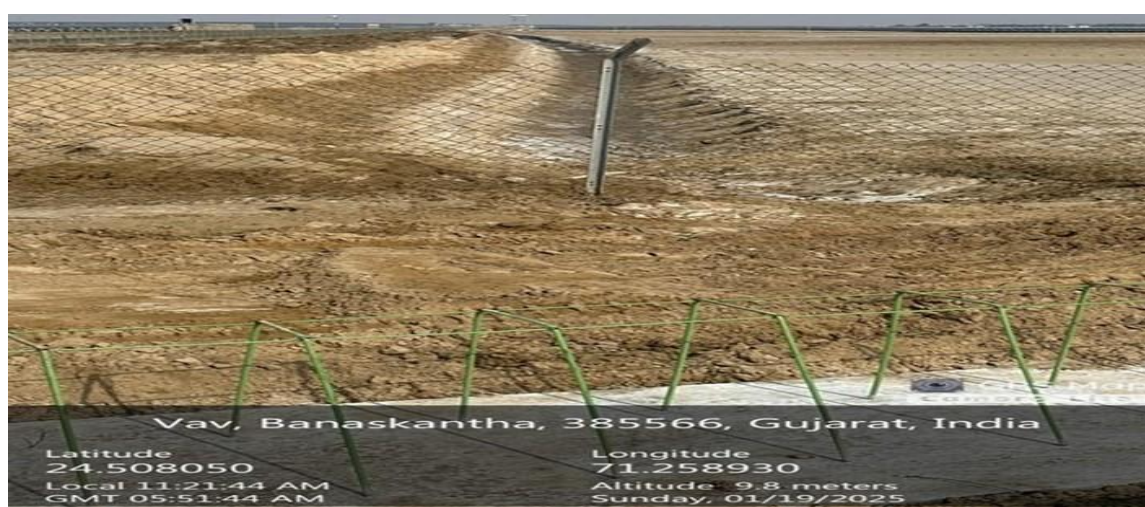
Drain outfall of Engie plot. Location of proposed box culvert
